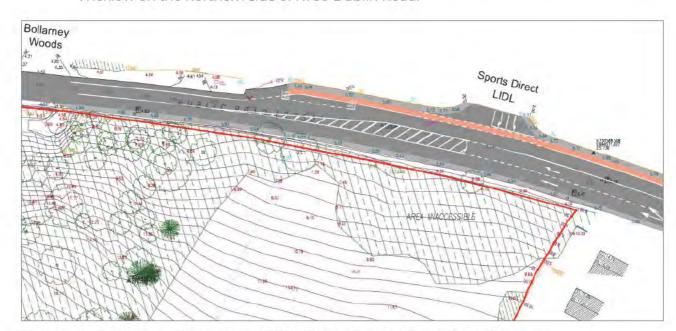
Existing Configuration of R750 Dublin Road at Subject Site Frontage
